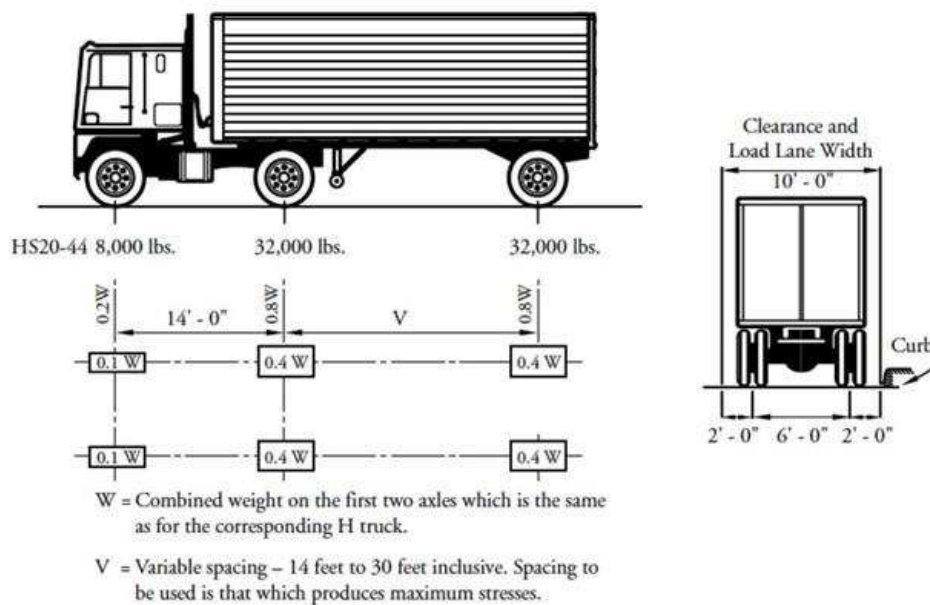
AASHTO HS20-44 Truck (Precast/Prestressed Concrete Institute, 2003)
